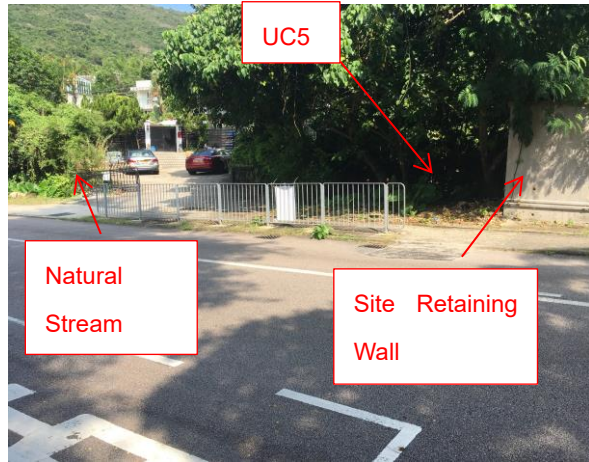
Surrounding areas at southwest of the proposed Site boundary
